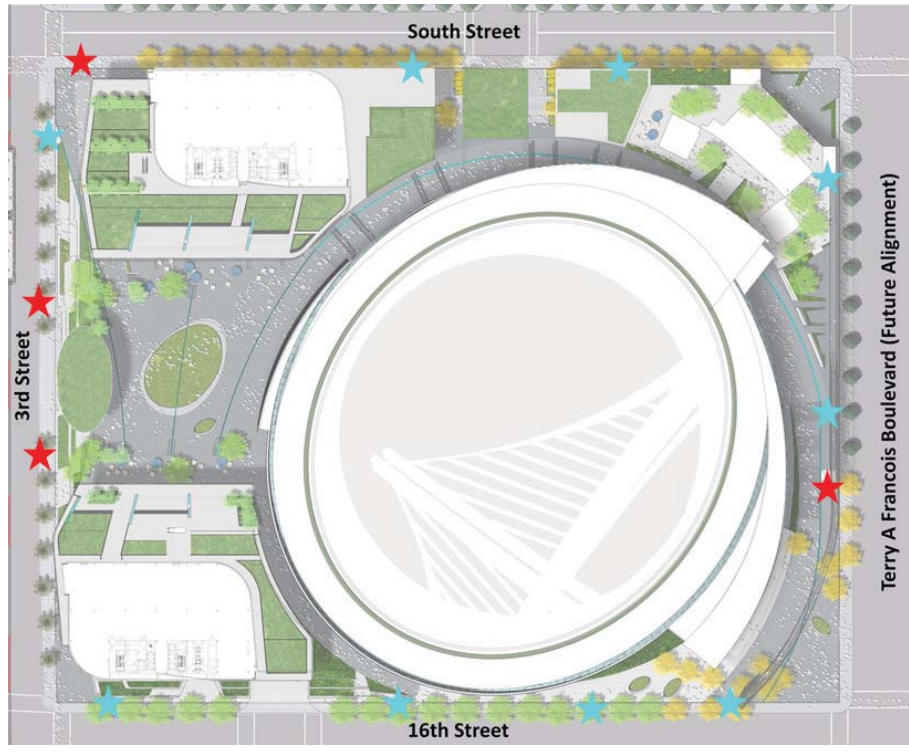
| Trash Receptacles (GSW Proposed Plan)
